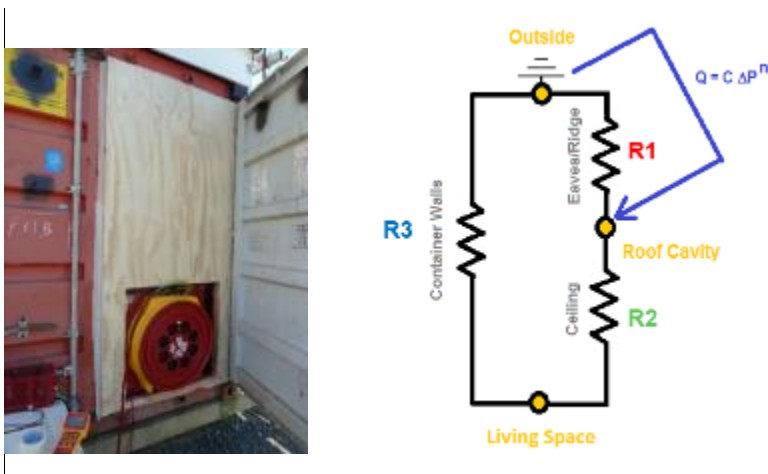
Representation of the skillion roof test set-up with its three zones (outside, roof cavity and living space) and the airflow resistances (R2 – ceiling, R3 – walls and R1 – roof including vent elements) between the zones. It is necessary to isolate and characterise each individual resistance element. The photo on the left shows the fan mounted to pressurise the lower container volume.
